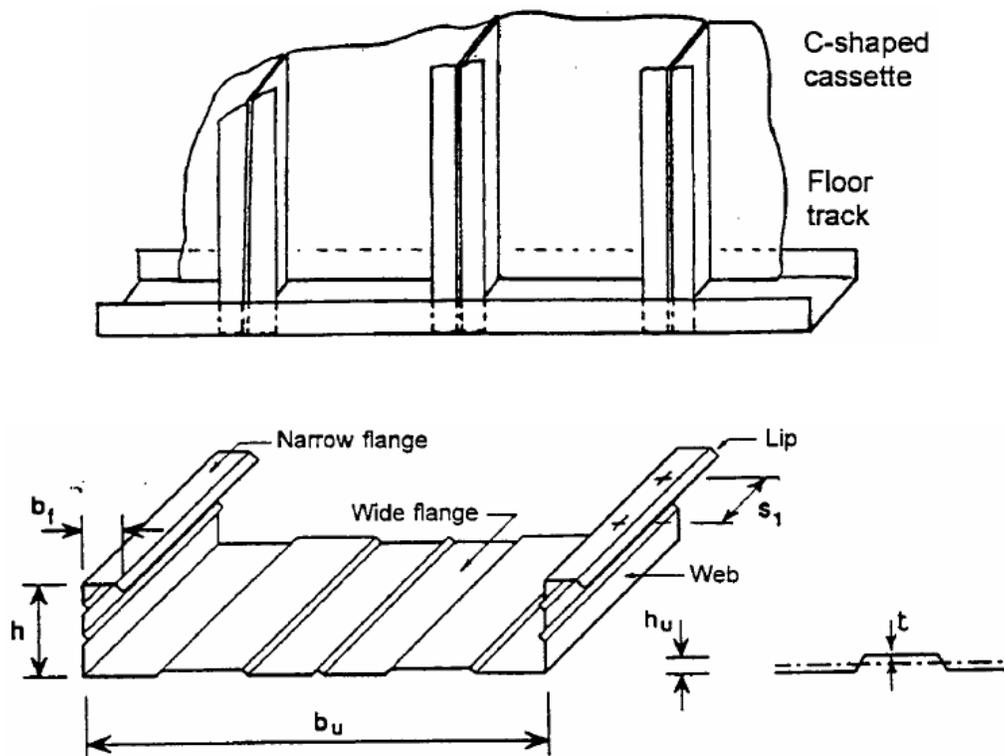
Cassette wall construction (Kaitila, 2004).
